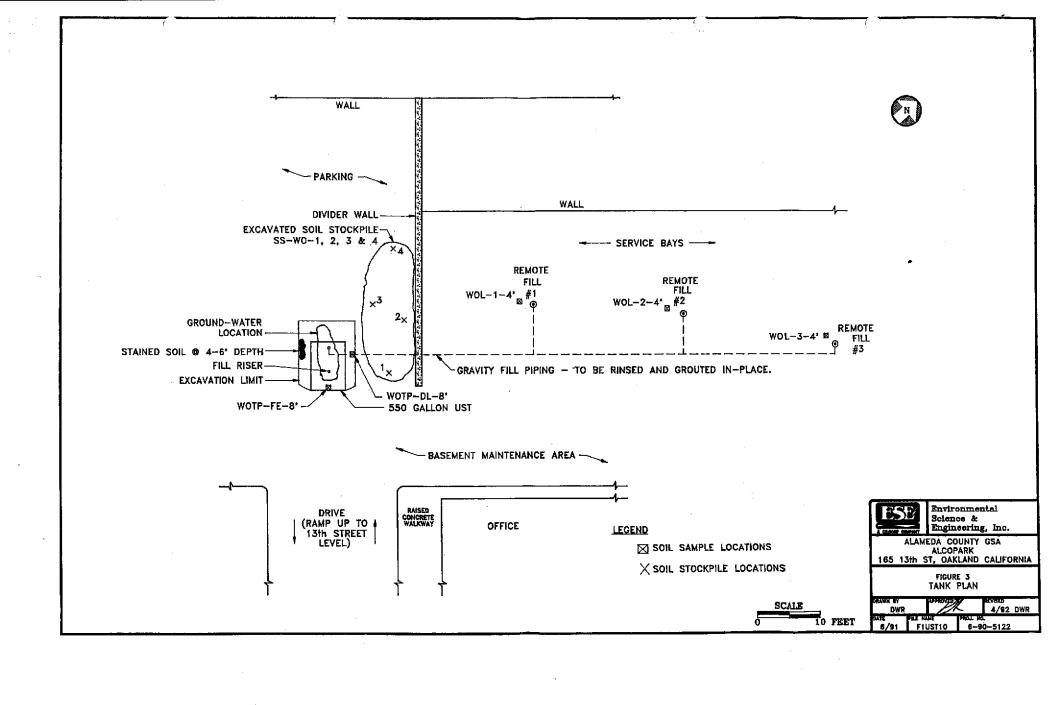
Location Map Figure 2 - Site Plan Figure 3 - Tank Plan
